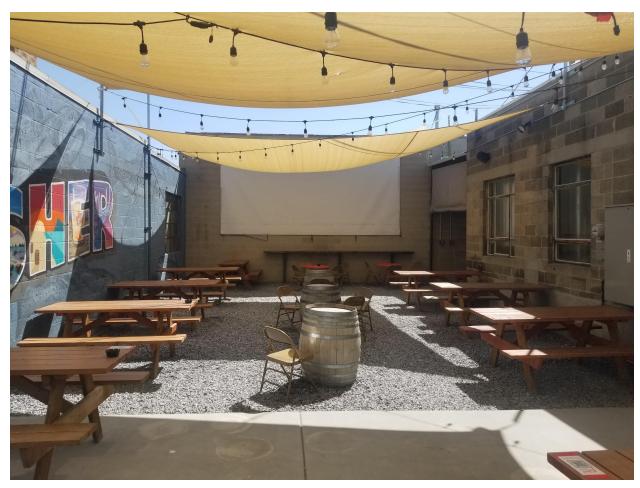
Existing north seasonal patio area with seating and existing screen. New concrete and a small overhead door will connect to the proposed expanded brewery area. The proposed new overhead door will be installed approximately where the existing screen is. See elevation drawings for details.
